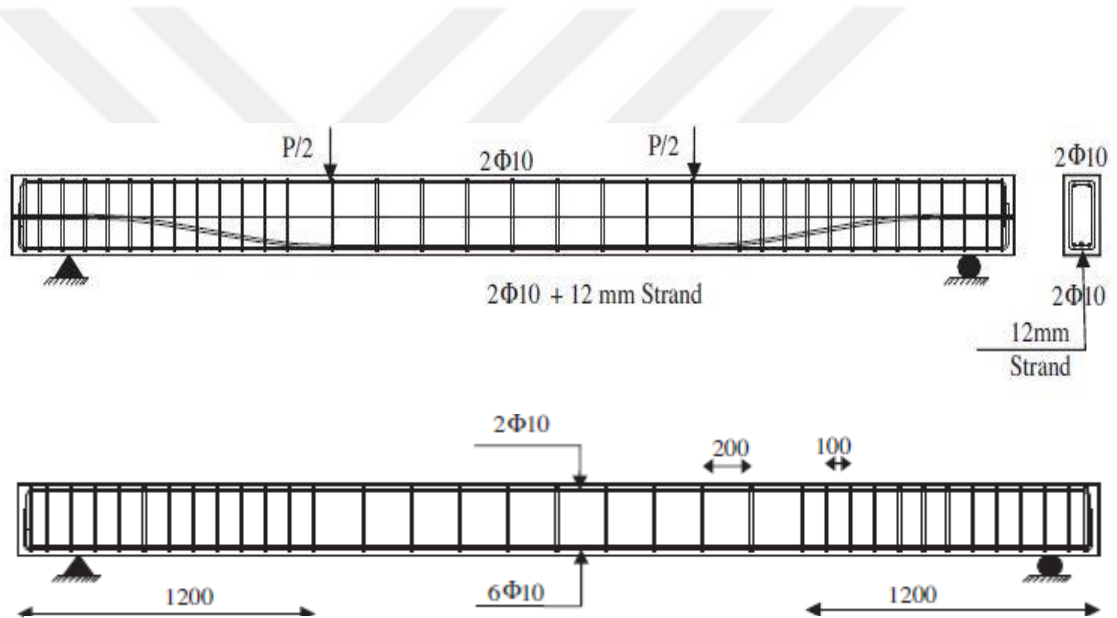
Reinforcement and dimension details of prestressed beam B2-70-P-B by (Hussien et al., 2012)
